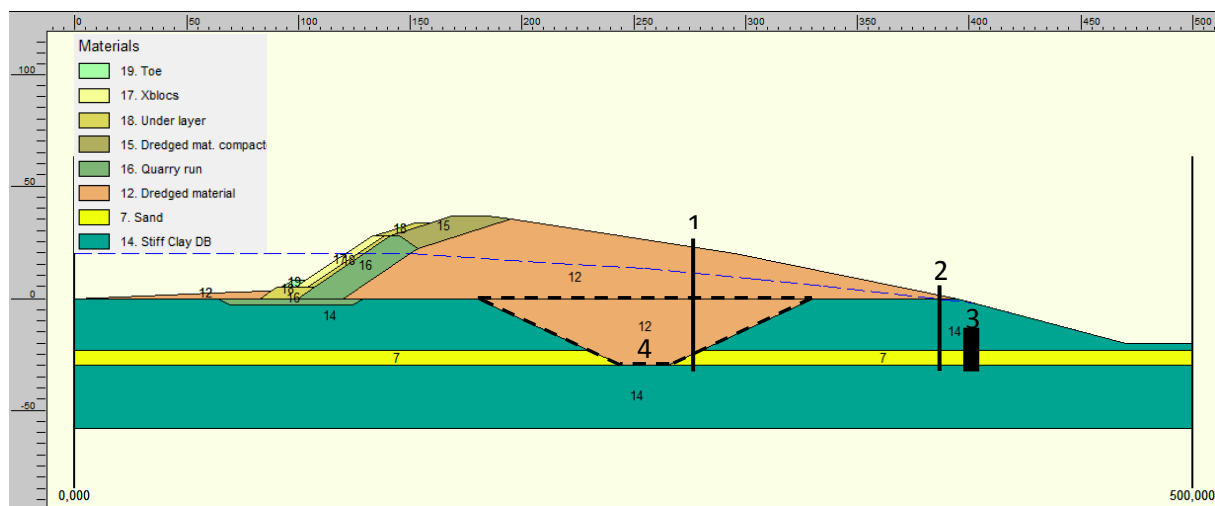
Possible measures that can be taken to 'close' the sand layer: 1) Slurry bentonite wall. 2) Sheet piles 3) Jet grouting. 4) Replacement of sand layer.
